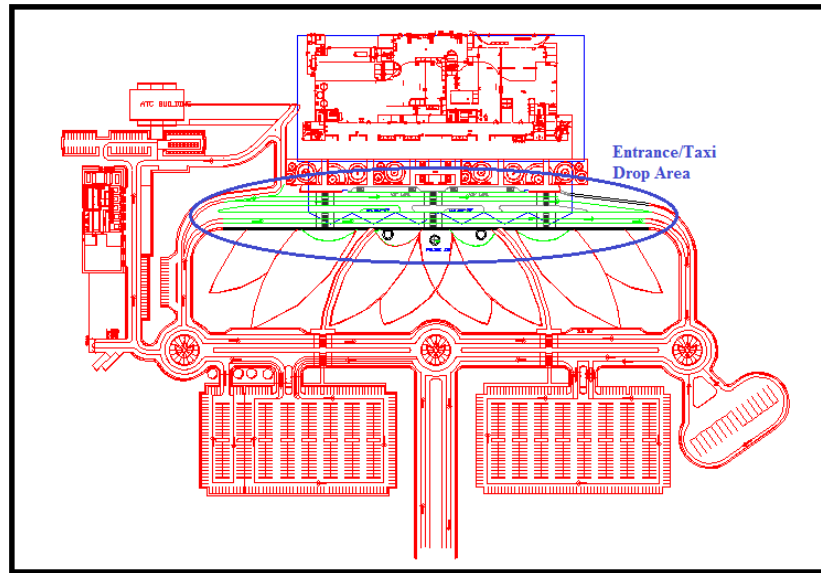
Typical Plan Layout of Entrance and Taxi Drop Area
